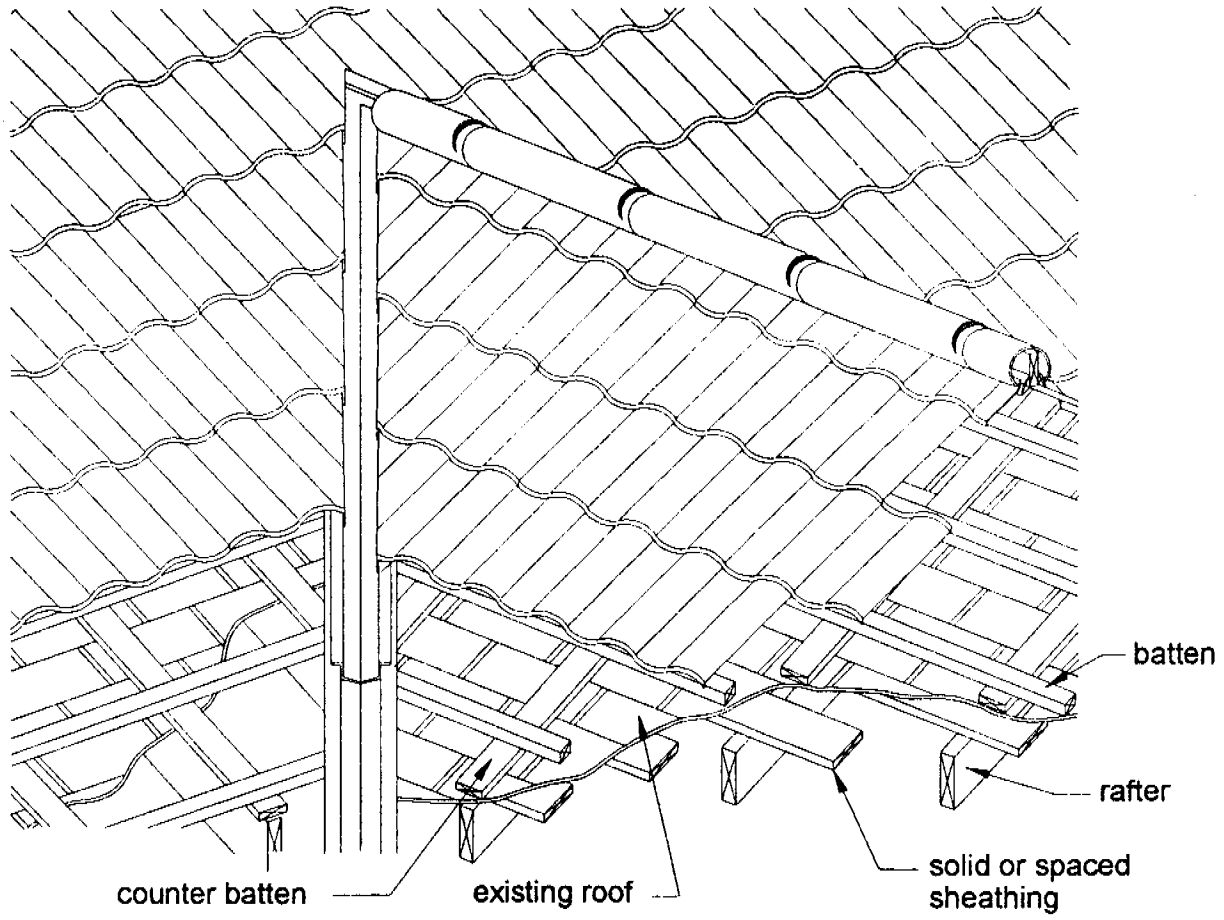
REROOFING OVER WOOD SHINGLES OR SHAKE
